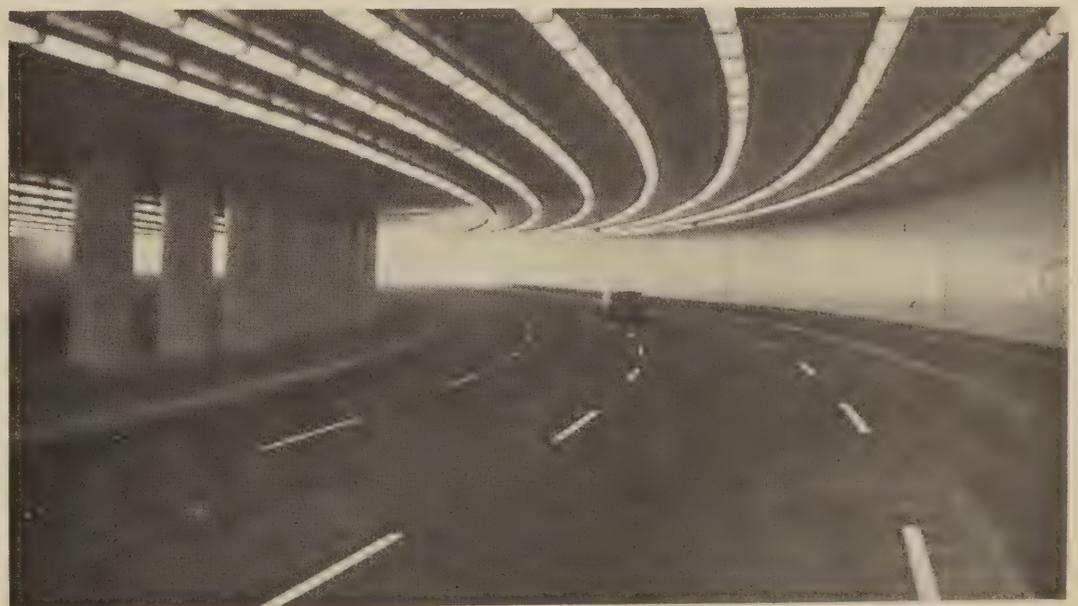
Virginia-New Hampshire Avenue Tunnel, Washington, D.C.—northbound from portal, daytime.
